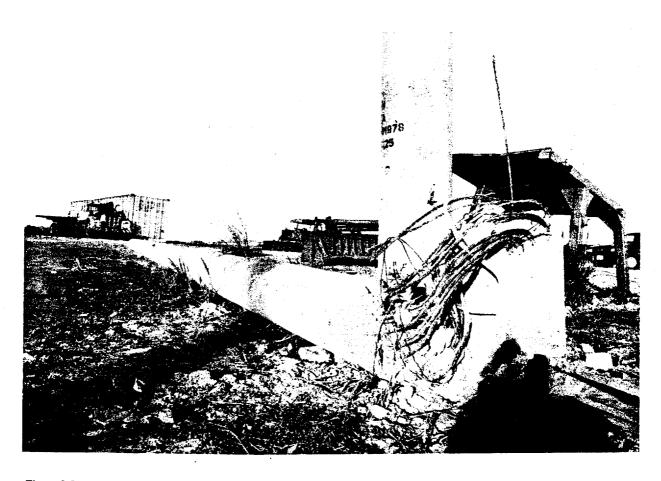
Concrete power pole on the highway north of Talofofo, Guam. The pole snapped about 5 feet above the ground and fell across the road. It was later pushed out of the road to enable traffic to pass. (Photo courtesy of Det 1, 1 Weather Wing/1Lt Joe Hanser)
